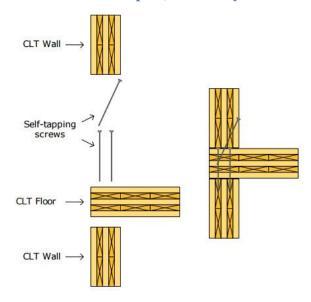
Wall-to-Floor Example (Karavabeyli and Douglas, 2013)
